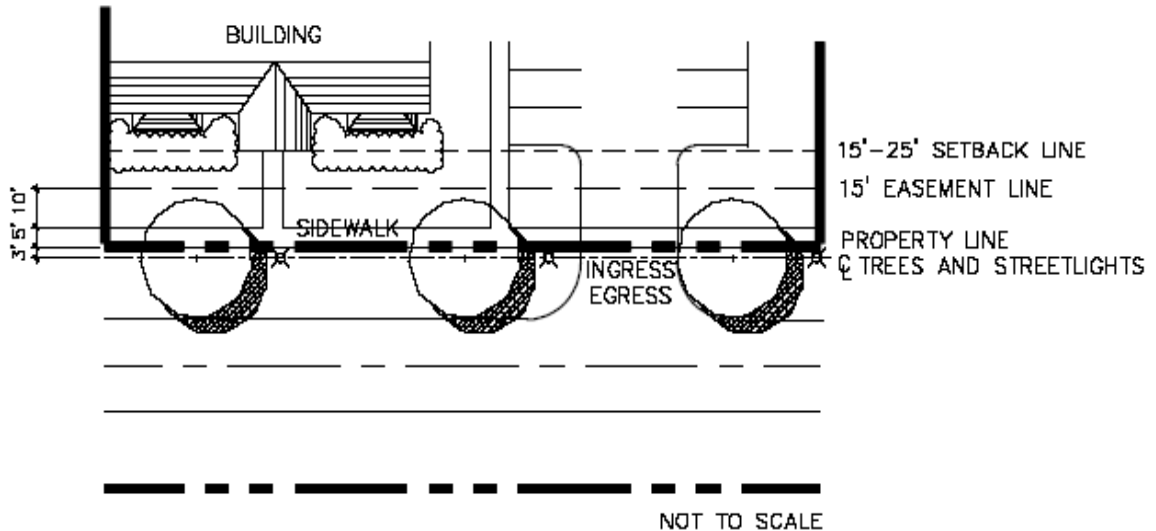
Greenbelt Plan View for the Hamlet One (H-1) District
